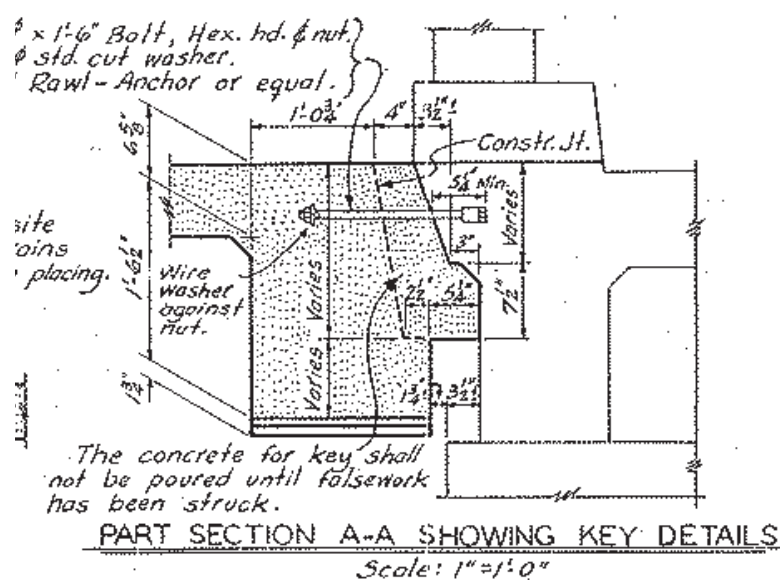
Construction Joint Detailing Example - Mechanical Anchorage Connection
